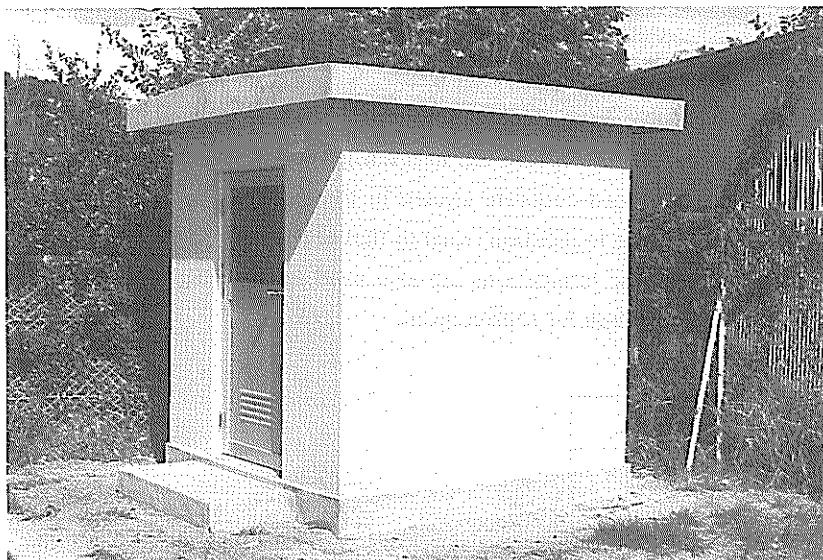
House of the Station (Onahama-ji-G, GB Station)
